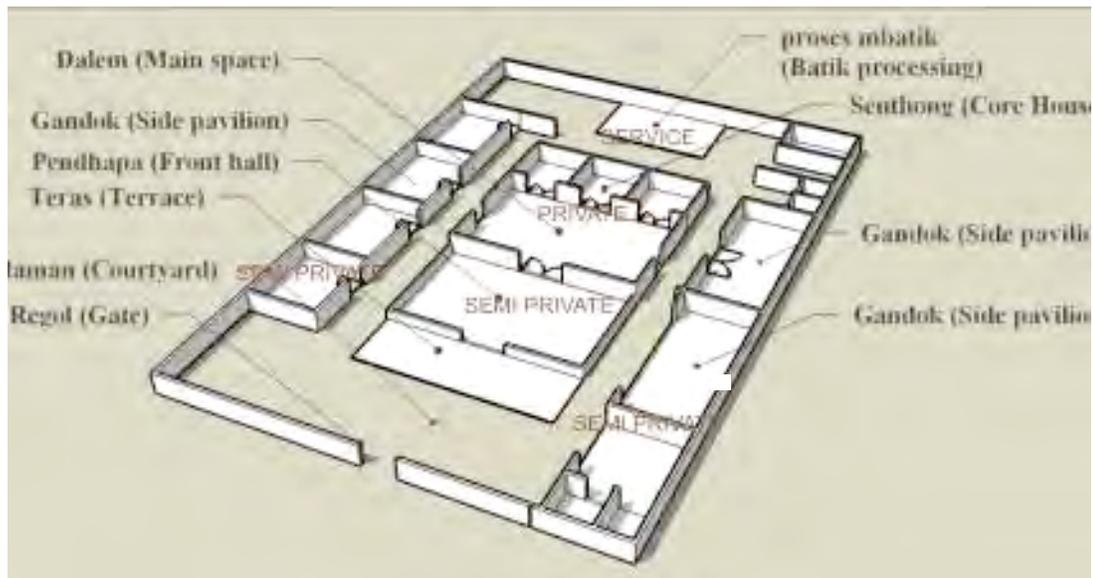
Sample [B] of the Javanese house: Original plan.
